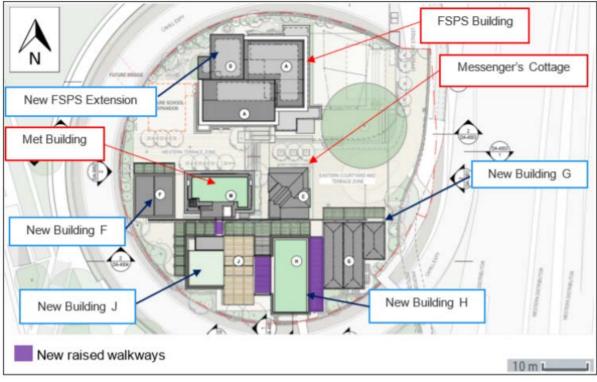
| Approved site plan (Source: Department assessment report, 2020)
